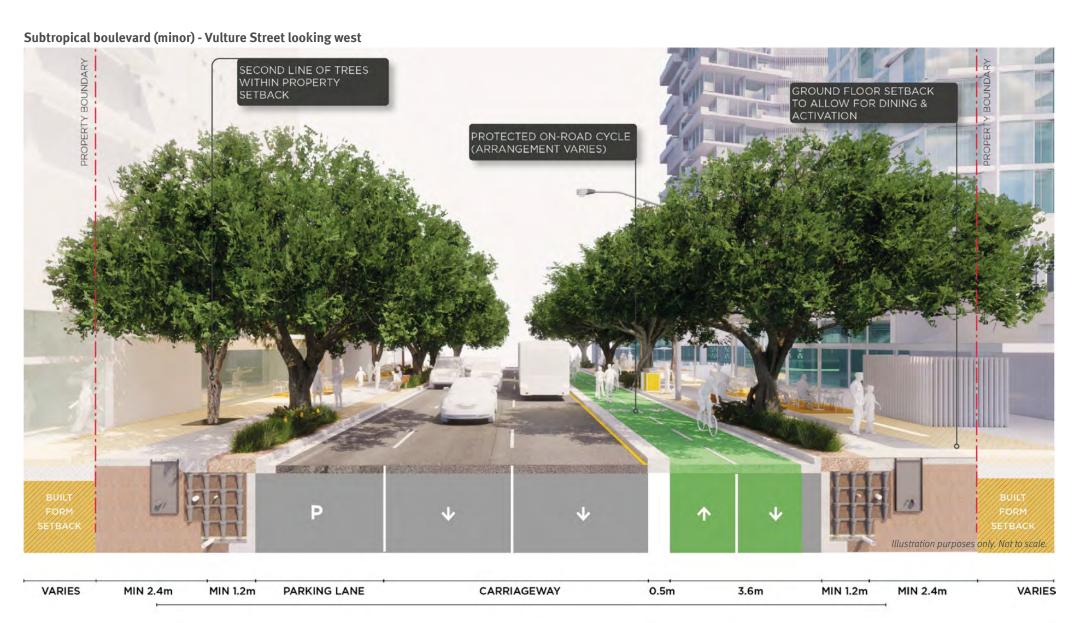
Cross section - Vulture Street - subtropical boulevard (minor)
